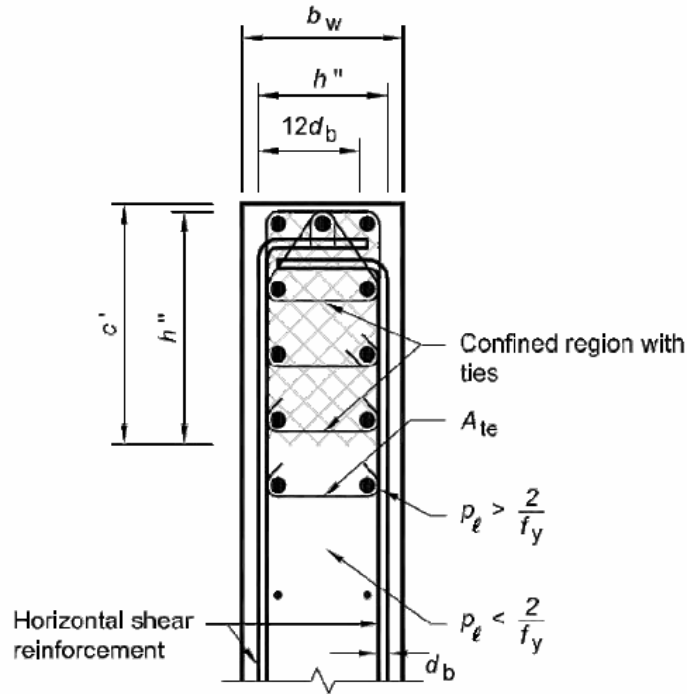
Typical detailing requirements for confinement at the end of a structural wall and for anchoring shear reinforcement as per NZS 3101:2006
